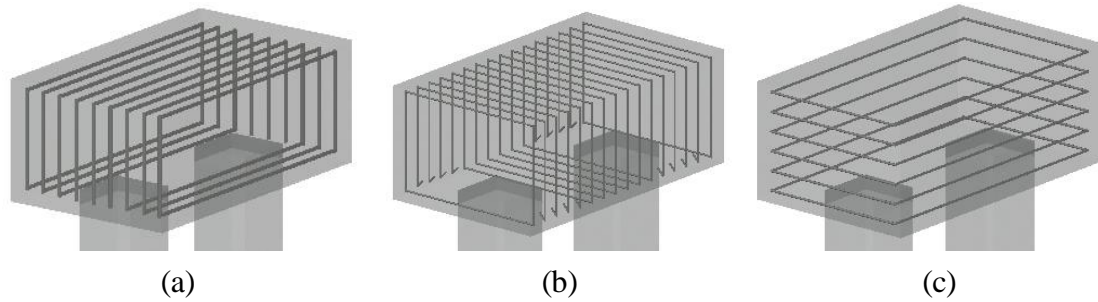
Sample pile cap reinforcement from (a) UPRR Bridge 126.31 (b) Burnt River Bridge projects
